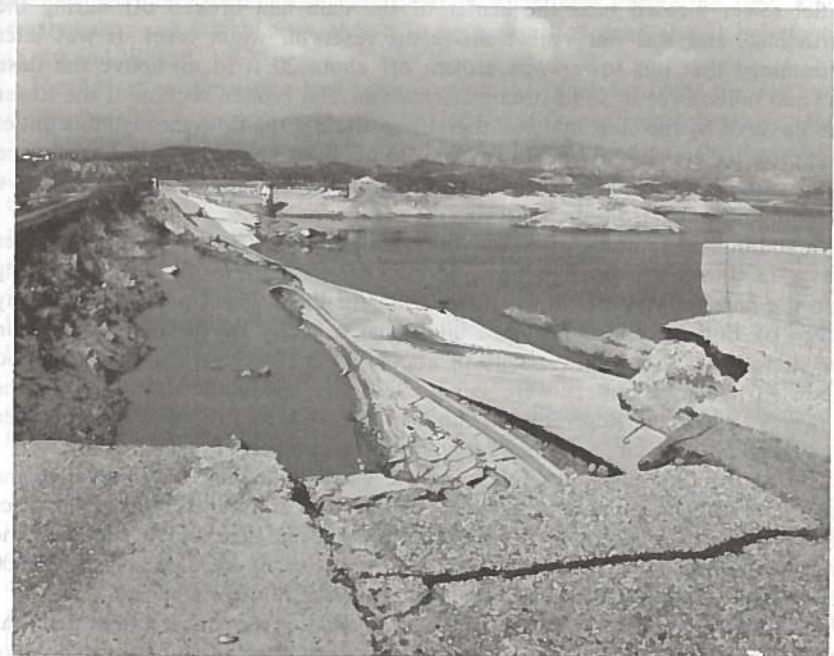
Slide Damage to Lower San Fernando Dam (Department of Water Resources, February 22, 1971)
